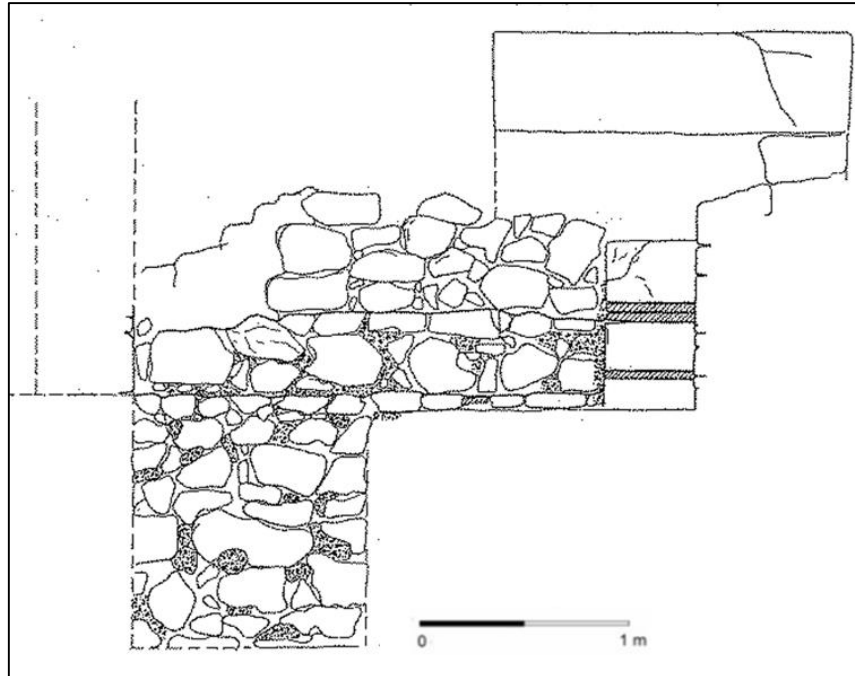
Cross section β - β' (see Fig. 94) of the family tomb at site D, view of the southwest wall. The entrance is left on the drawing. Shaded areas represent bricks; dotted areas the remains of plaster. Drawing by Marc Waelkens, 1989.
